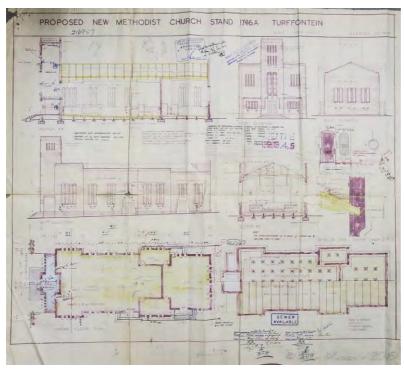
Original plan for Methodist Church, Turffontein (Source: City Council of Johannesburg, Plans Archive)
